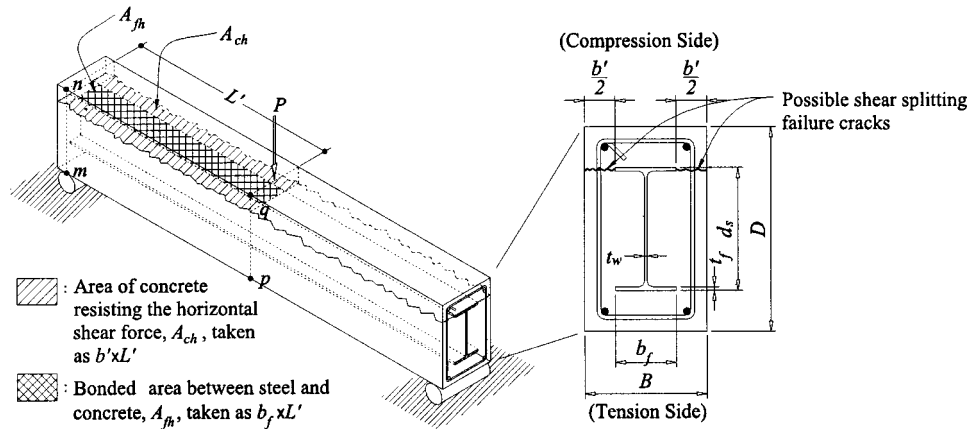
Proposed analytical model for shear splitting failure along interface between steel flange and concrete
